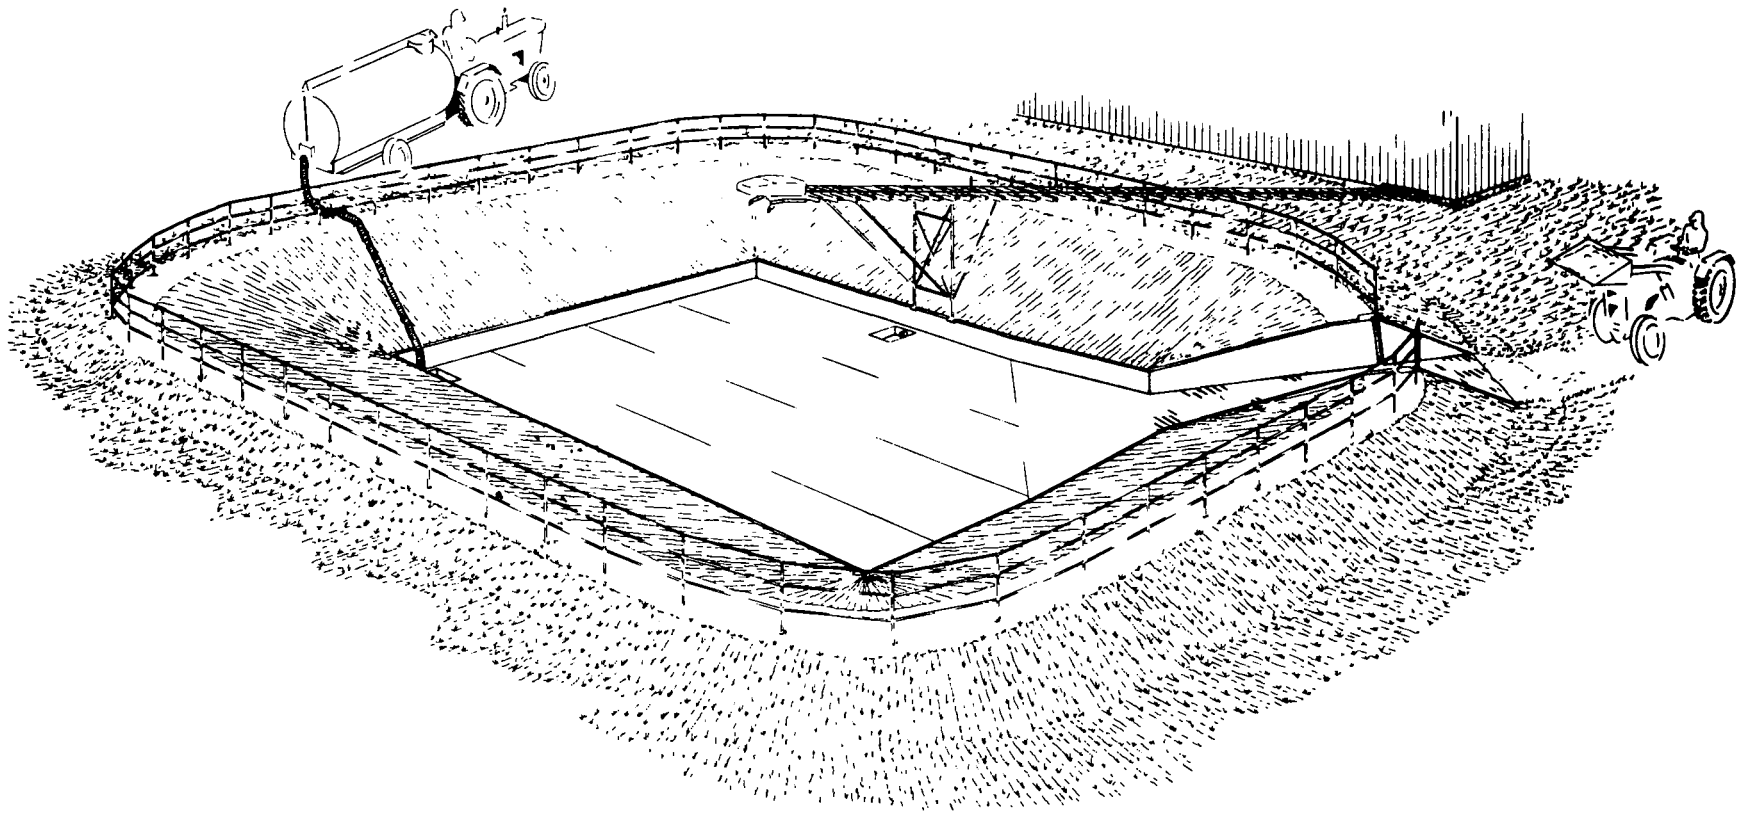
Curbed Slab Manure Storage with Earth Banks (CPS Plan 2376)
